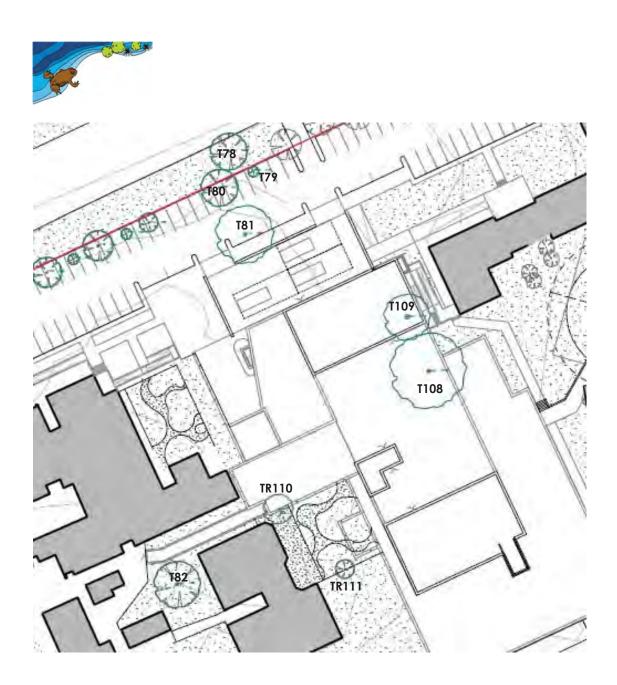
EXTRACT Proposal Diagram for building works showing trees
